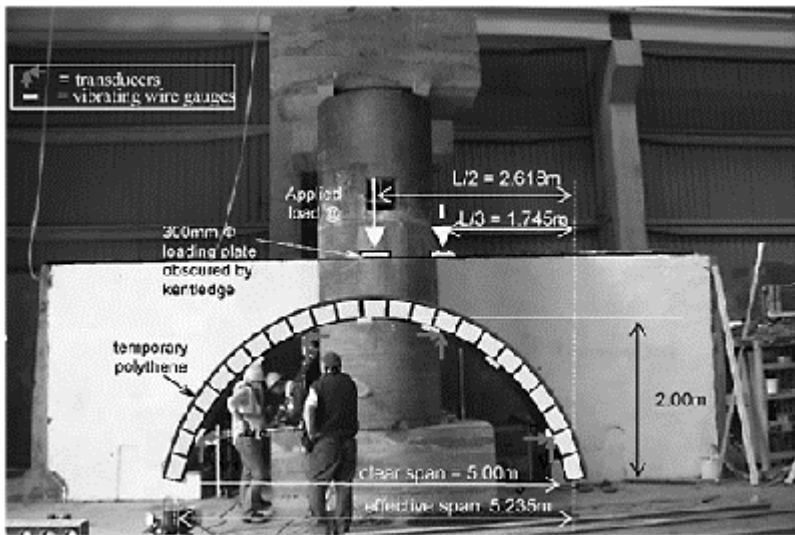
Instrumentation and test-set-up for arch ring and arch with backfill.
